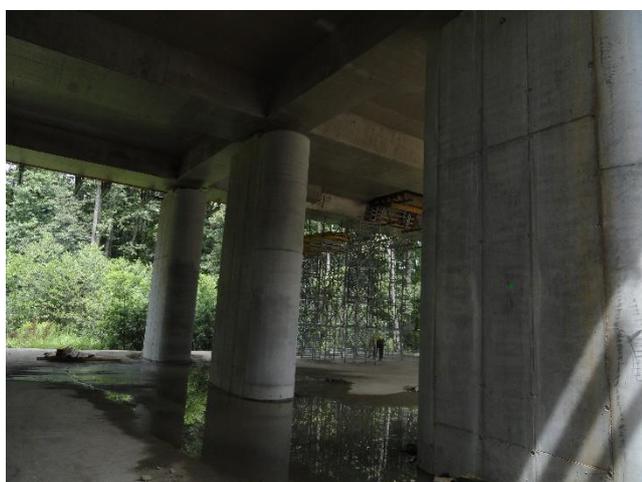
General view of the oval support columns of the left-hand carriageway of the bridge structure
